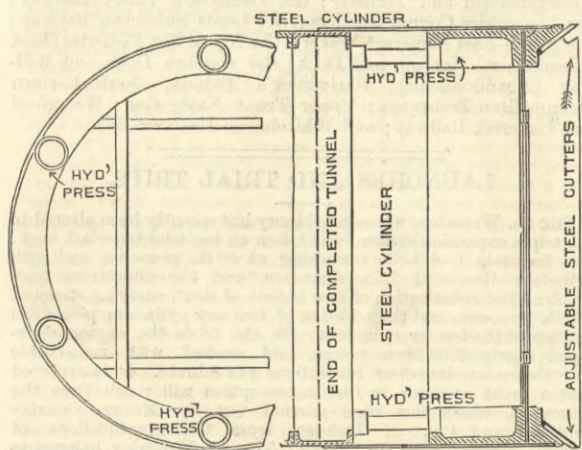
SECTION OF TUNNEL END AND SHIELD.
